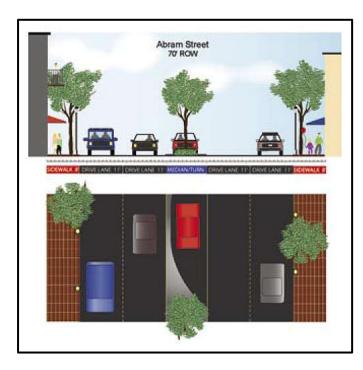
70-foot Right-of-Way Section for Abram Street; Downtown Master Plan, 2004
